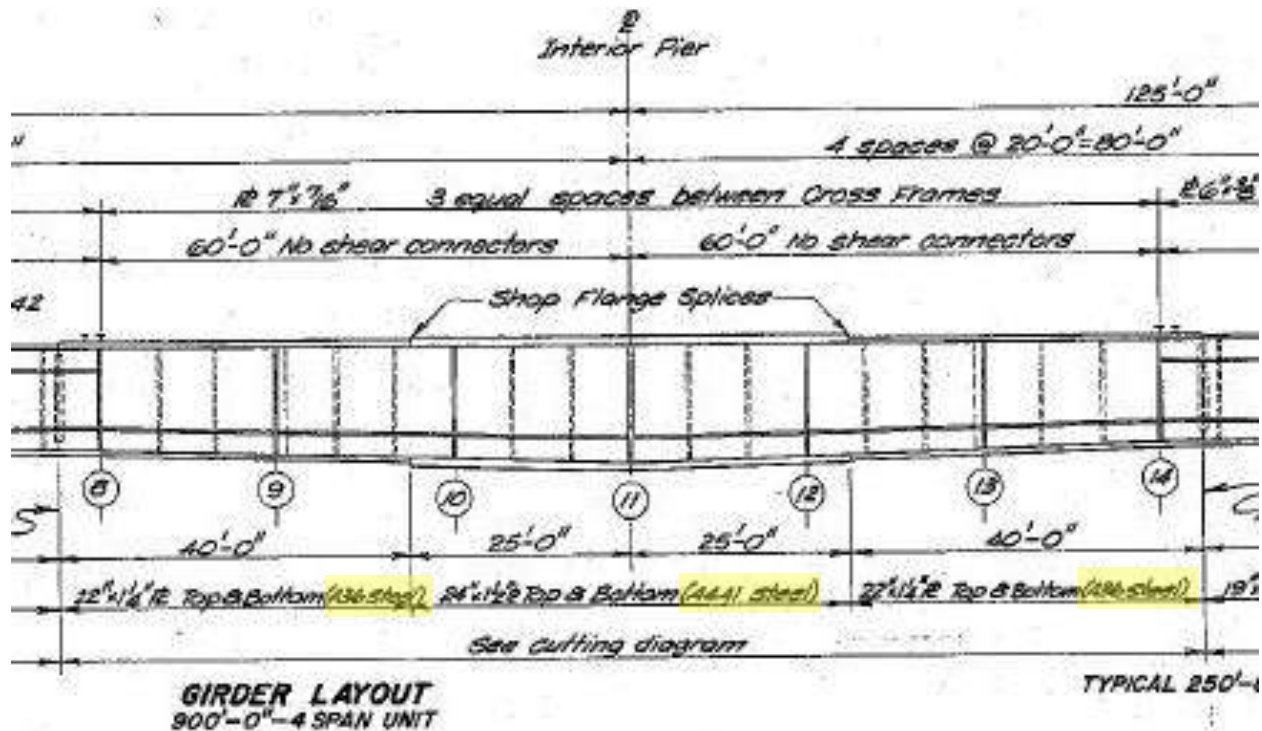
Details from superstructure plan sheet showing placement of A36 steel and A441 steel (highlighted in yellow) welded together into girder web.<sup>11</sup>
